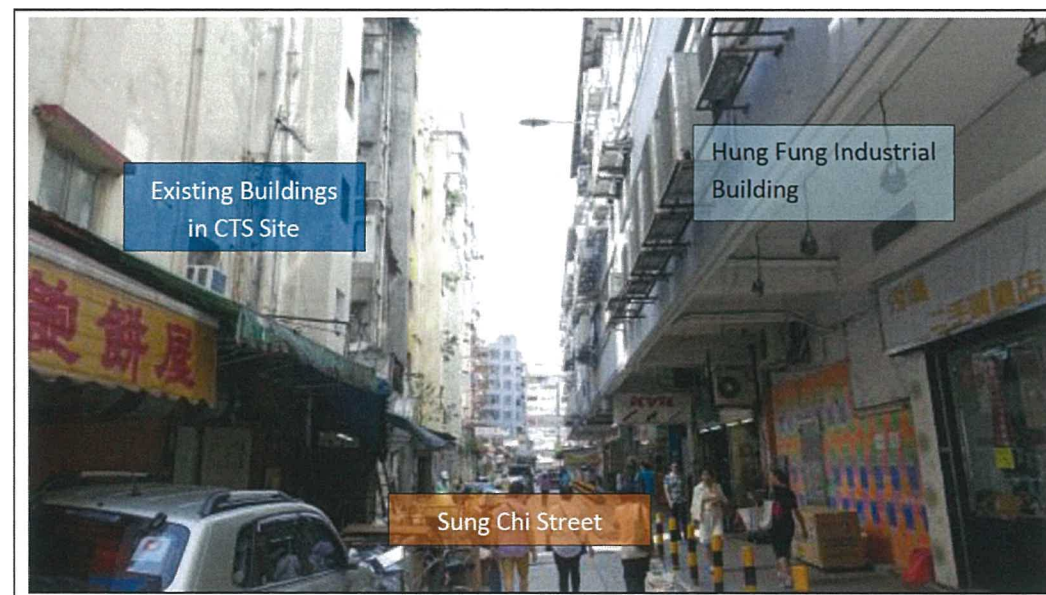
Currently Sub-standard Sung Chi Street Between Existing Buildings on Chun Tin Street (CTS) and Hung Fung Industrial Building, View From Hok Yuen Street
